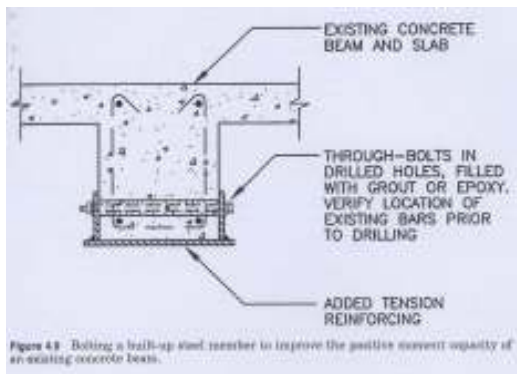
Bolting a built-up steel member to improve the positive moment capacity of an existing concrete beam.
